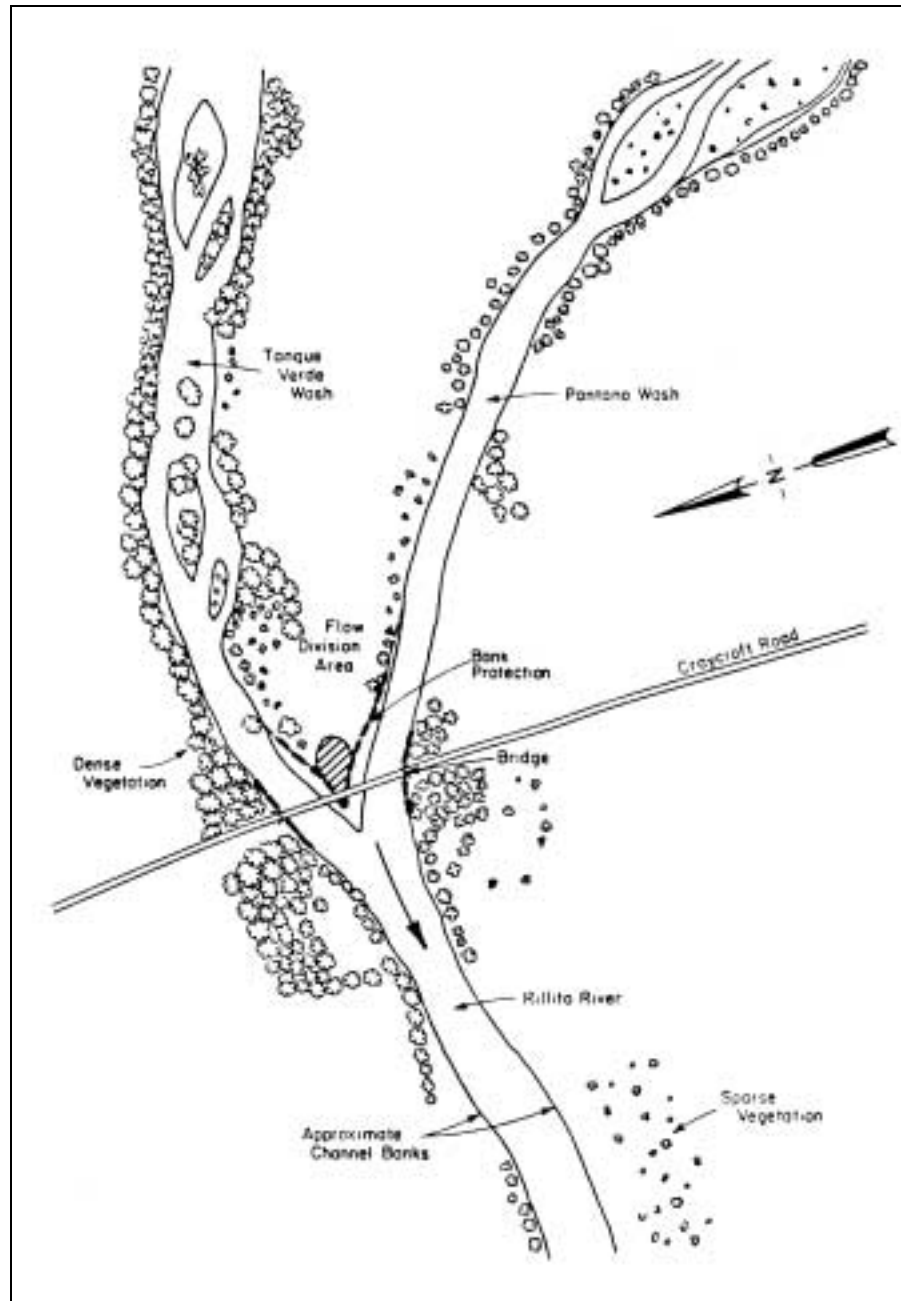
Alternative I for Craycroft Road Bridge crossing.
